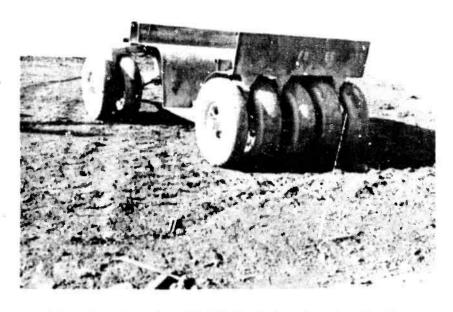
ROLLER BODY WITH SMALL SECTION REMOVED
